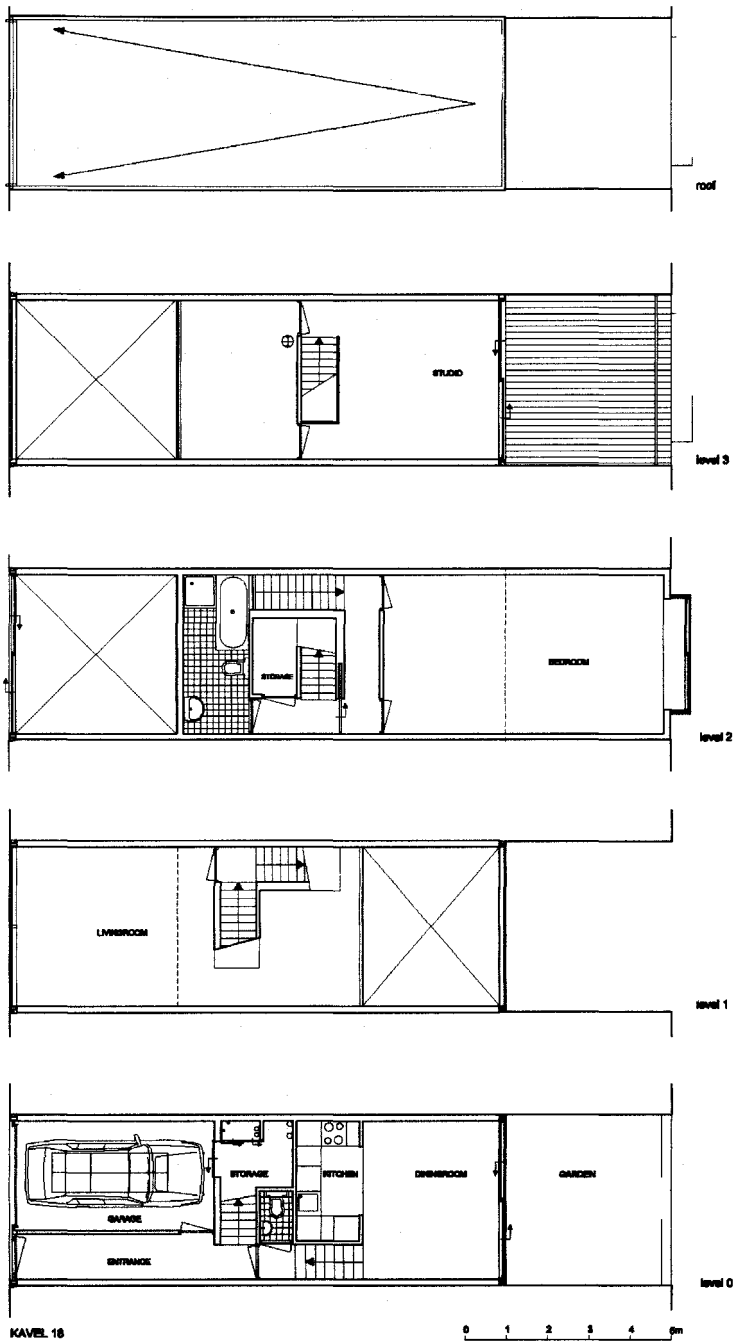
MVRDV, Borneo House Number 18, floor plan (reproduced by permission from MVRDV Architects).
